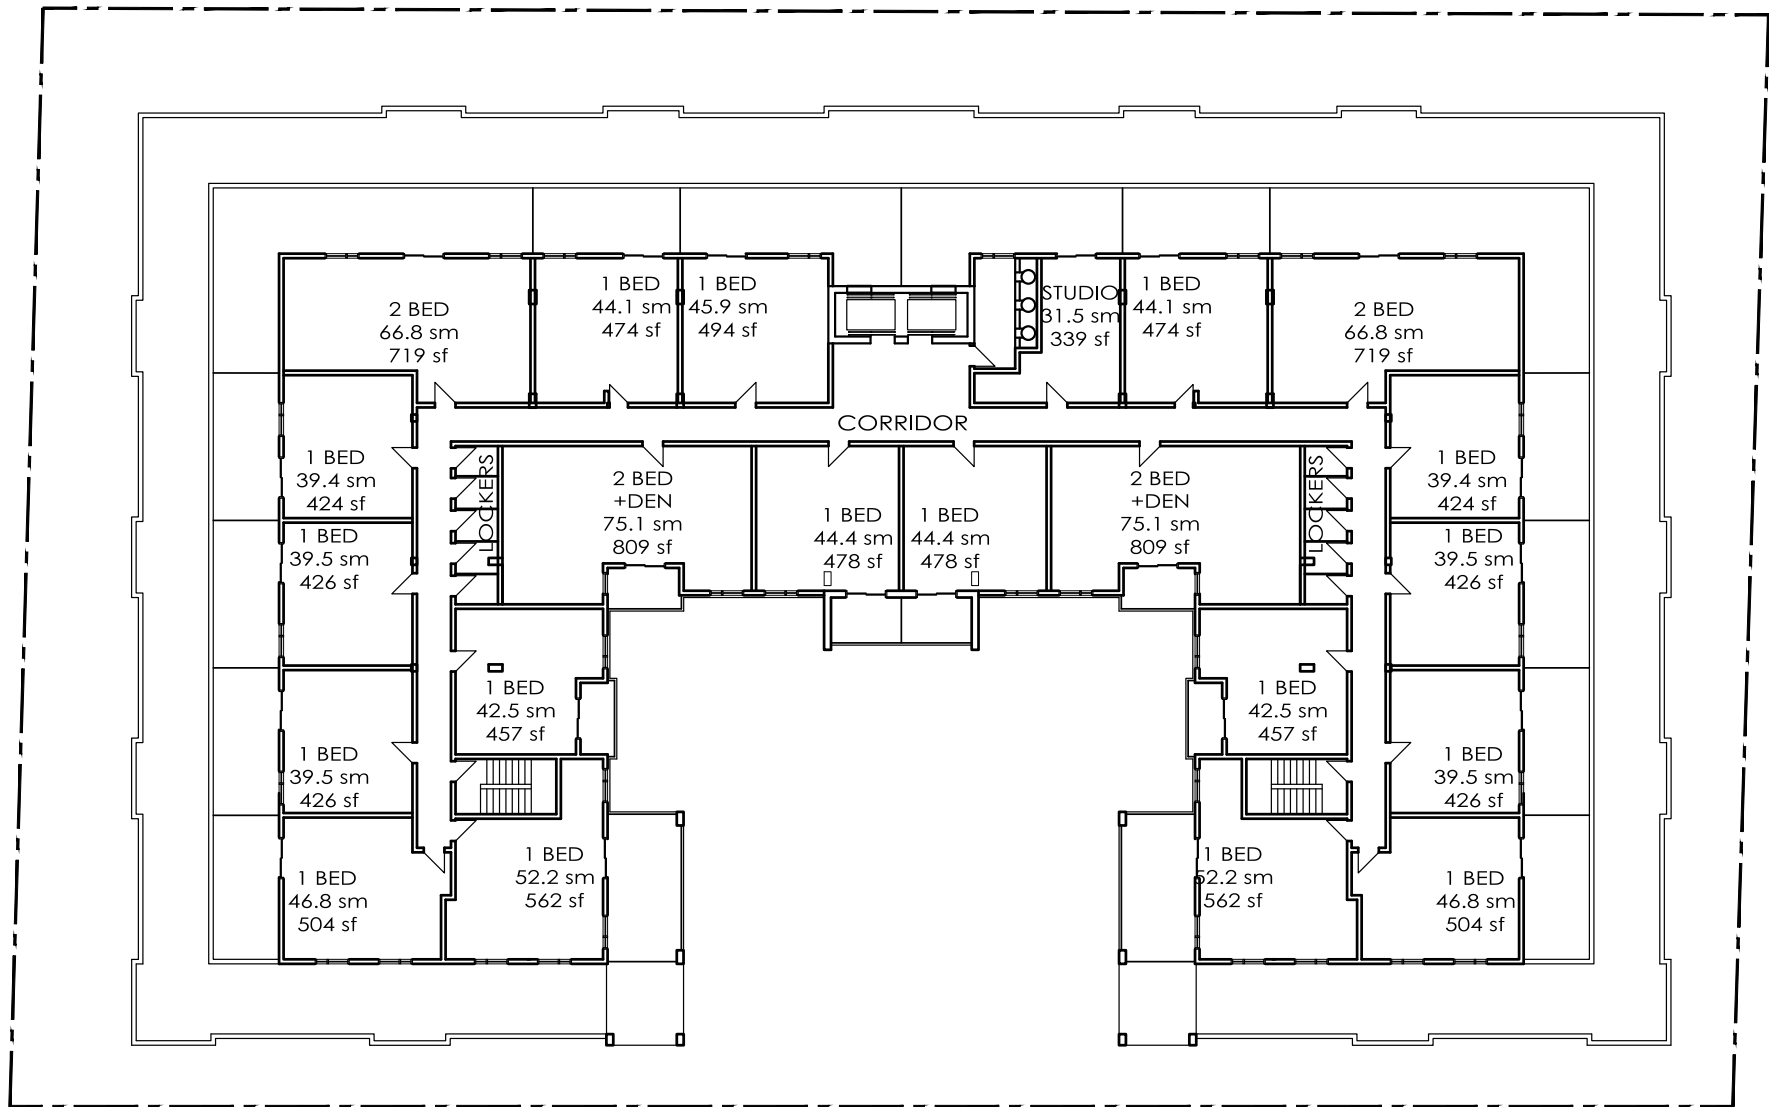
Fifth Floor Plan prepared by Lintack Architects Inc.
